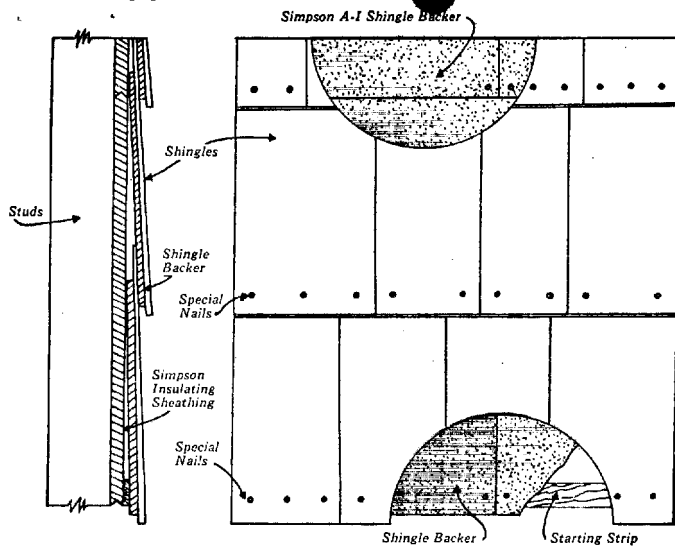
Detail Showing Application of Shingles or Shakes to Simpson A-I Shingle Backer and Simpson Insulating Sheathing Using Special Nails.^a
